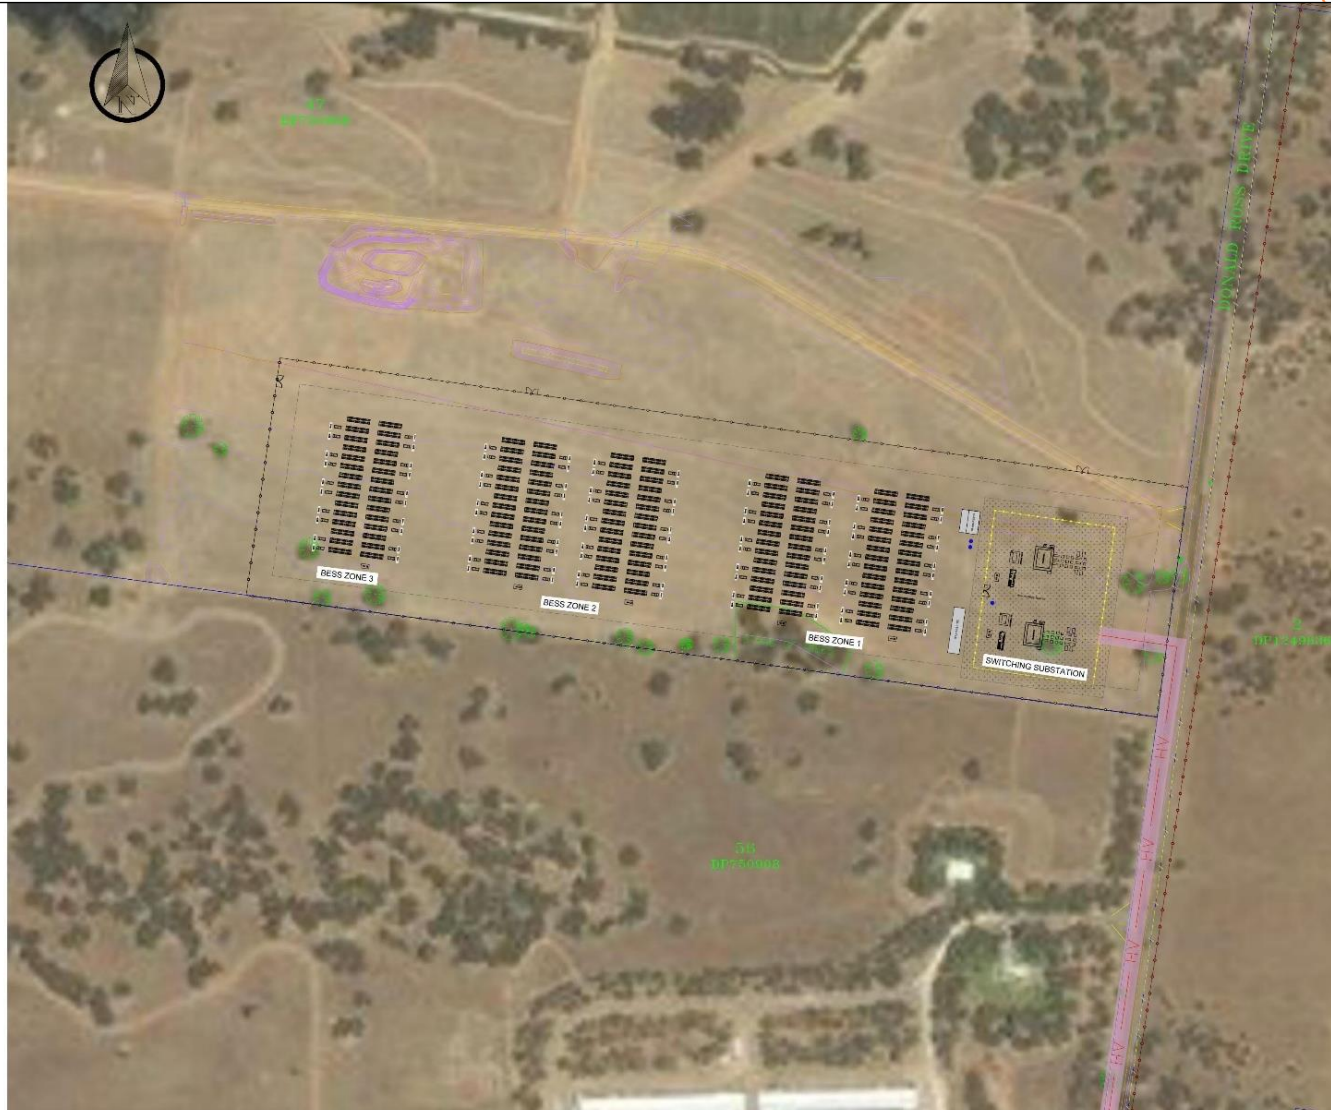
and Figure 9 shows the concept layout and connection route to the Transgrid Substation.
